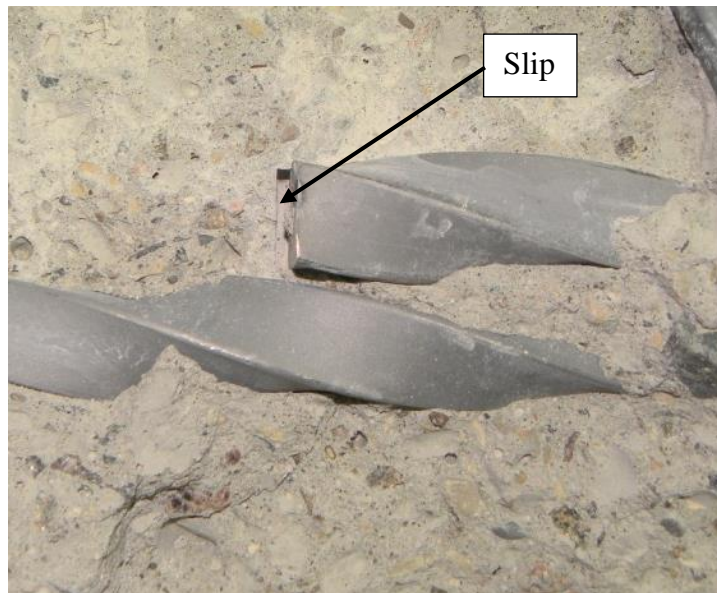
End Slip of Longitudinal Reinforcement Following Concrete Removal for Specimen 25♦-410↑
